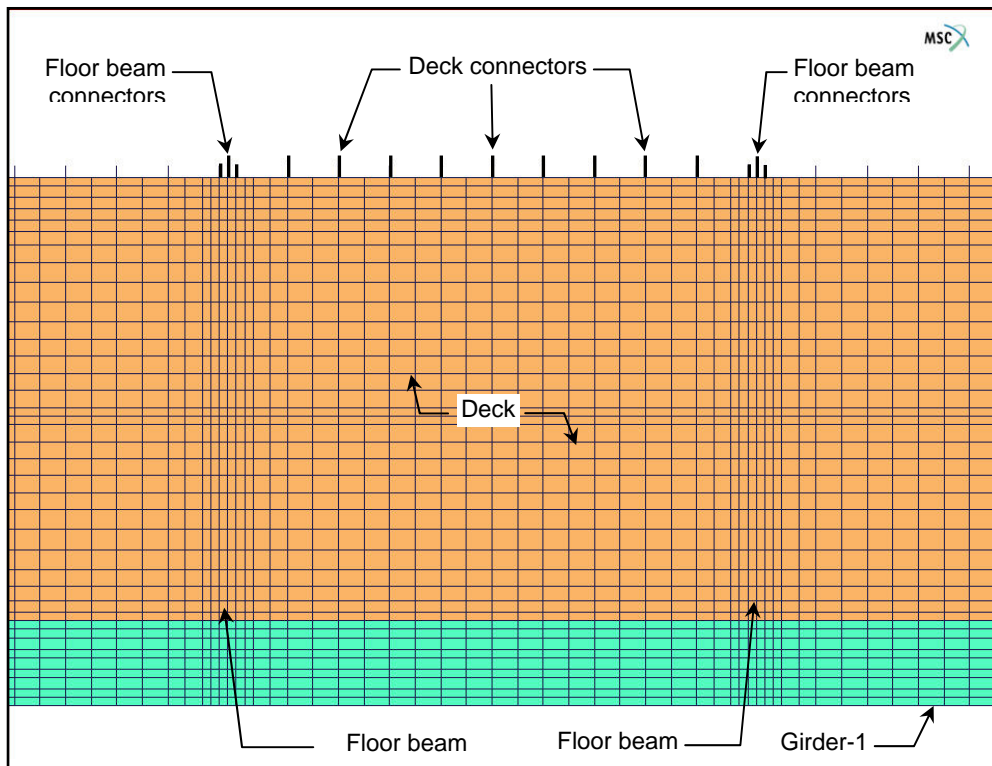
Location of deck connectors (plan view) (Girder-2 not shown).
